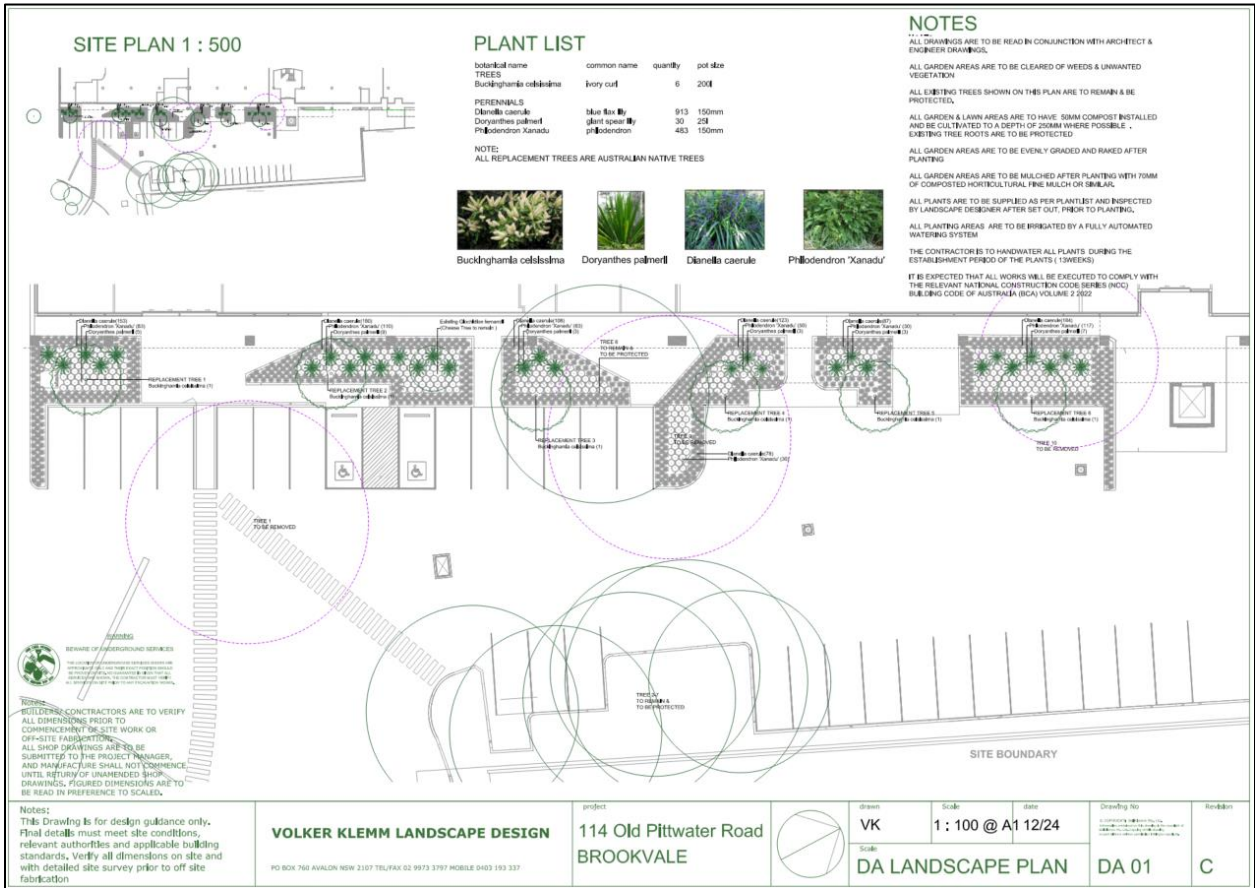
Landscape Plan (Source: Volker Klemm Landscape Design, 2024)
